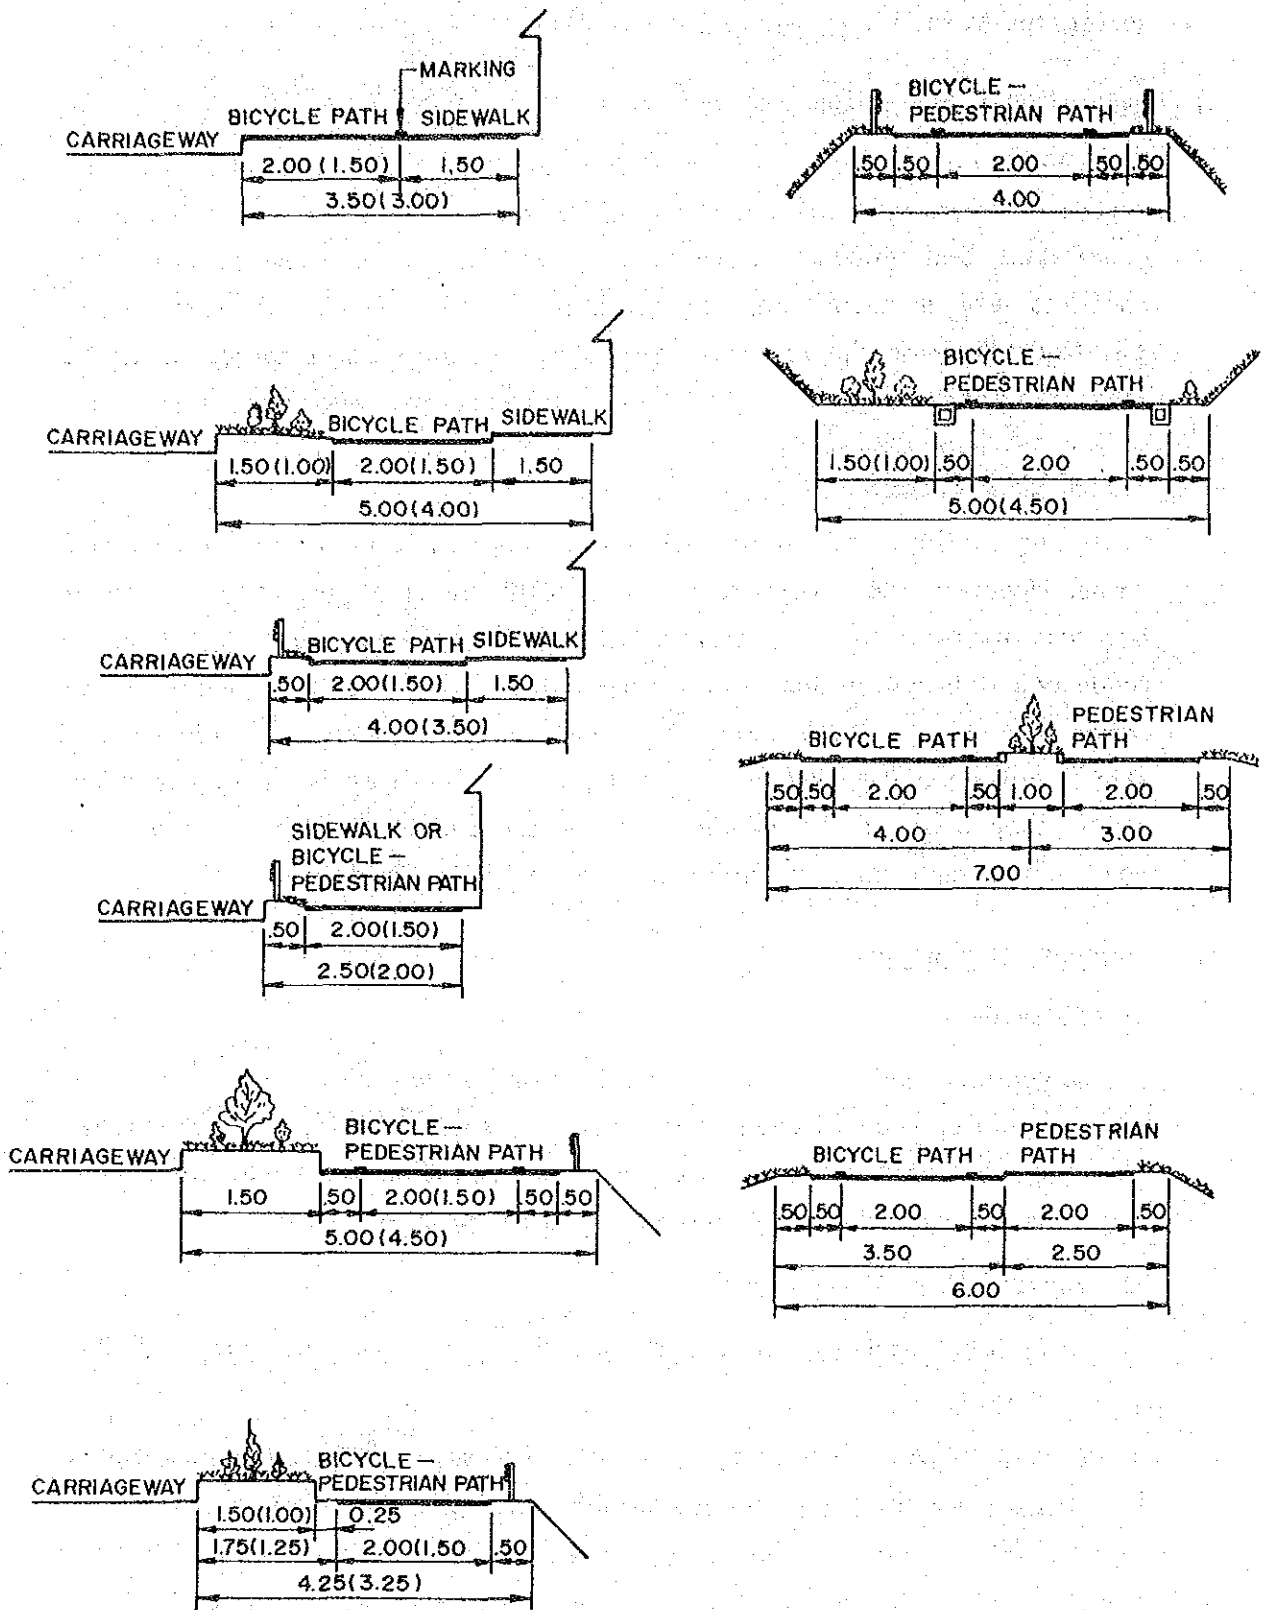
Typical Cross-sections of Slow Traffic Paths
